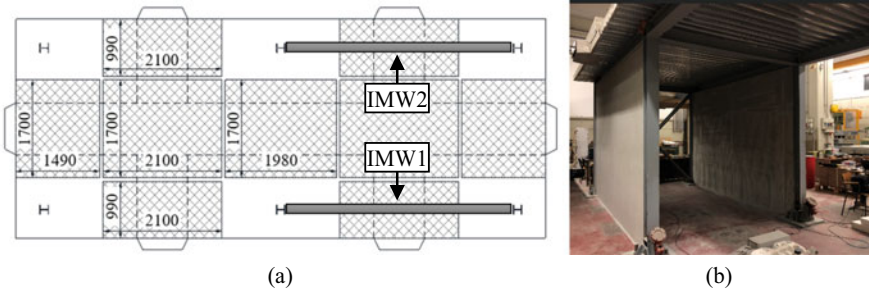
Laboratory mock-up: a plan scheme with added masses and infills, b picture after infill construction
